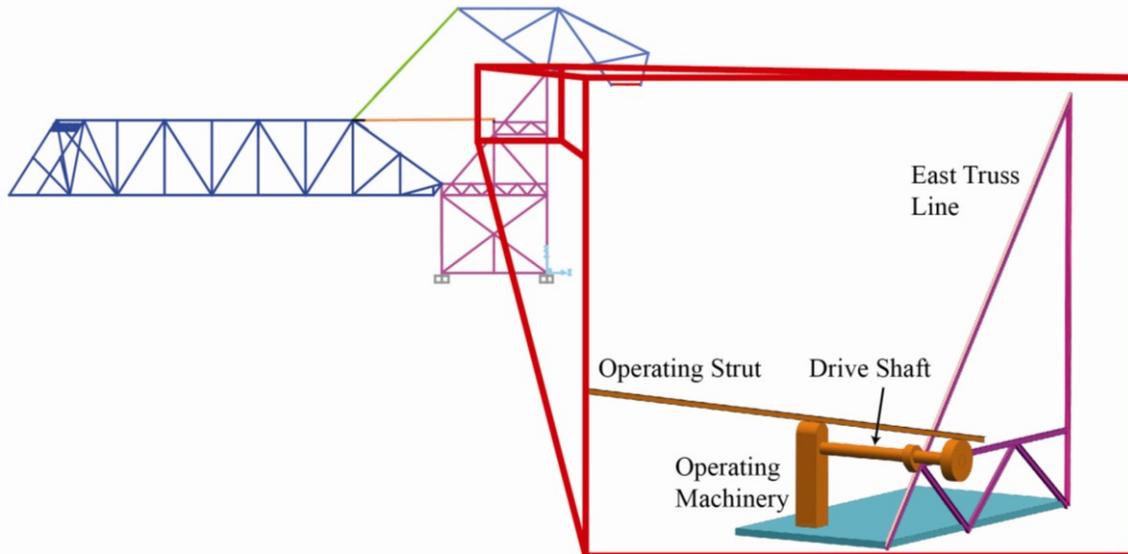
Schematic of Drive Shaft and Operating Strut
